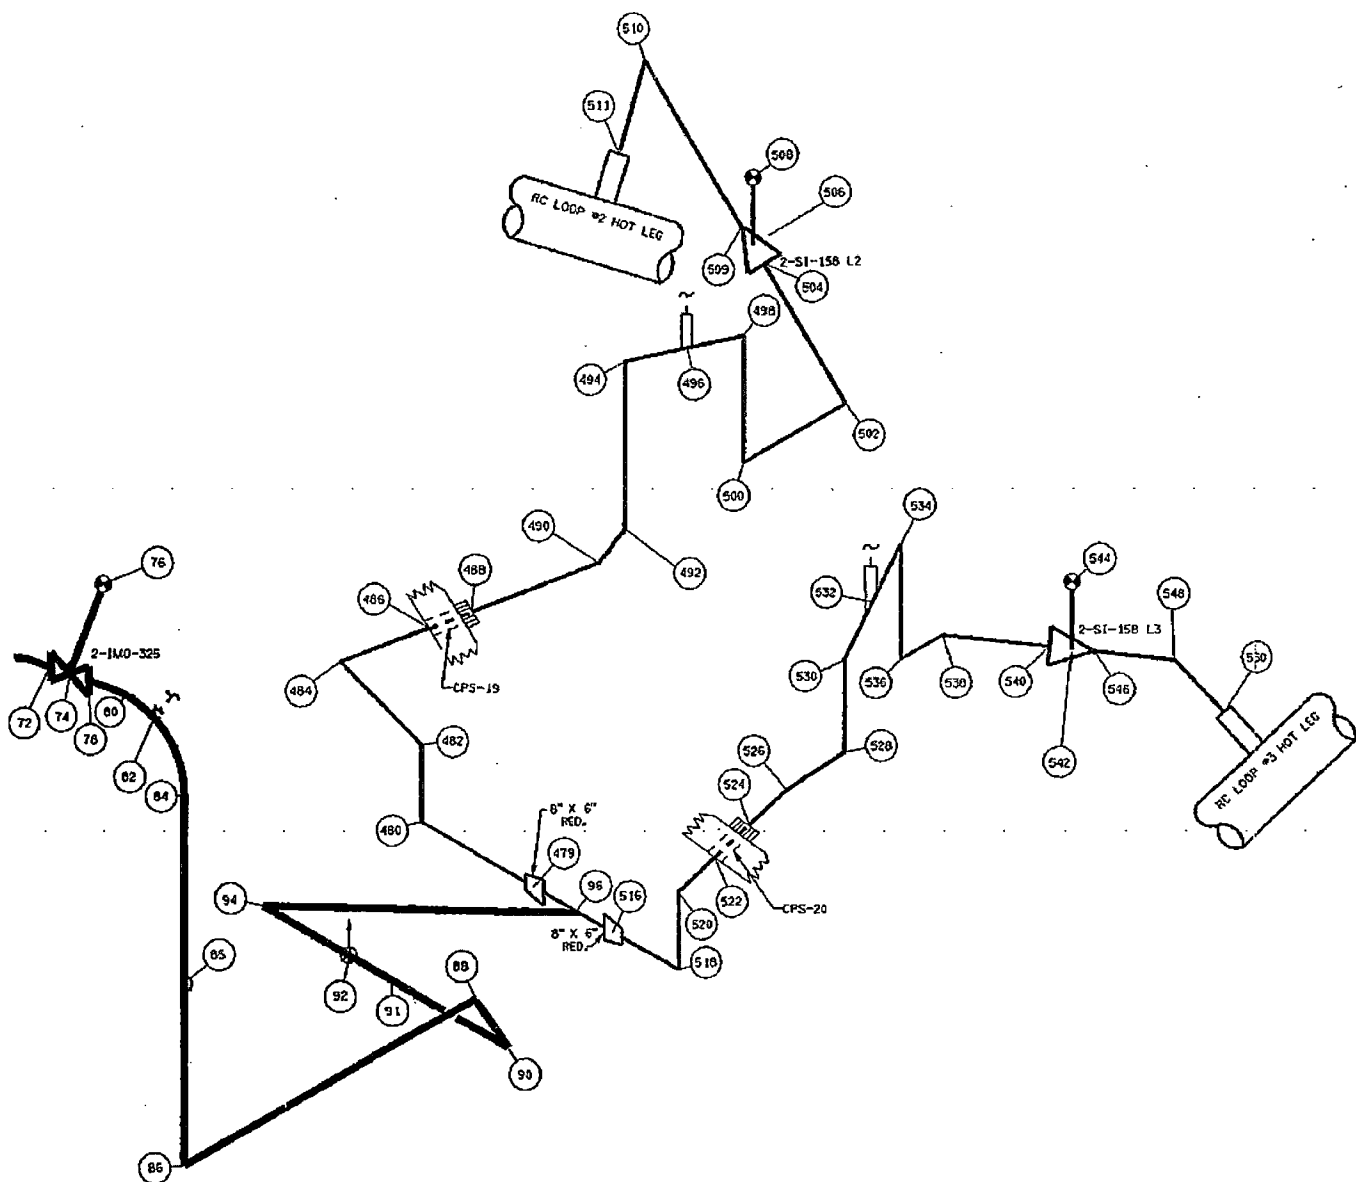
D.C. Cook Unit 2 Hot Leg SI Line Layout Showing Weld Locations with Node Points – Loops 2 and 3
